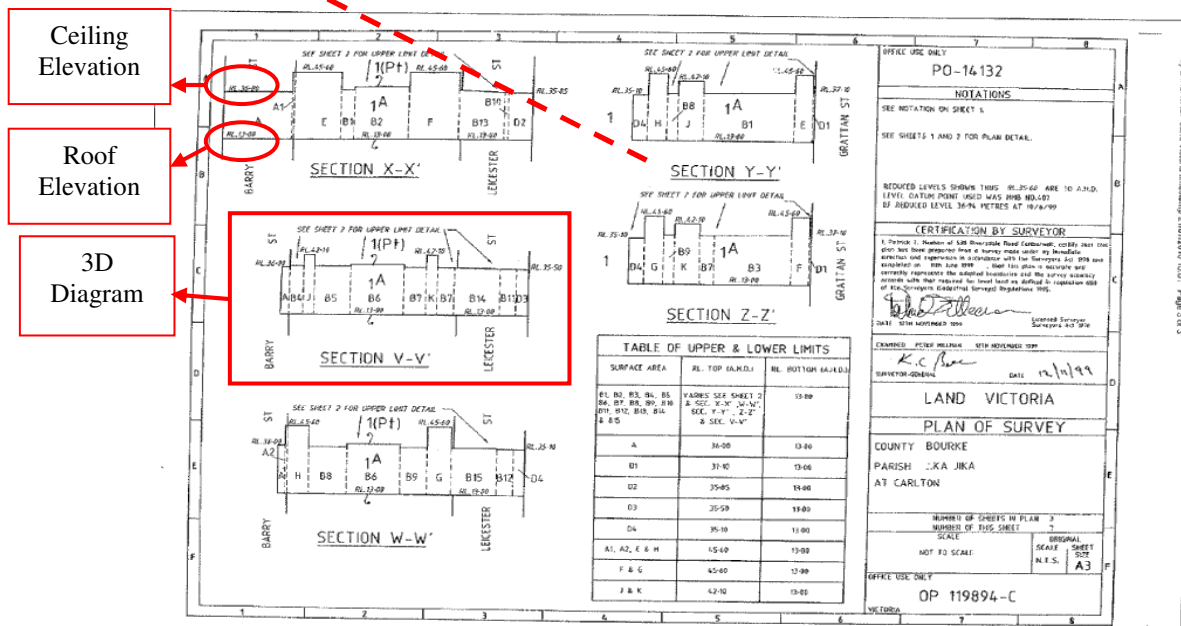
(c). Cross Sections on plan of survey- Sheet 3
